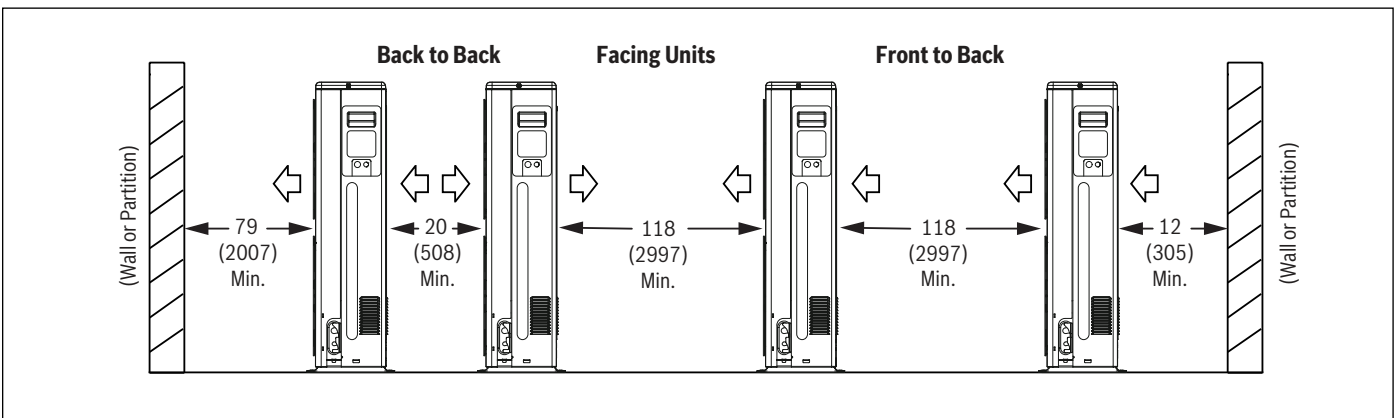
Installation of two or more outdoor units in a front-to-back - inches (mm)
